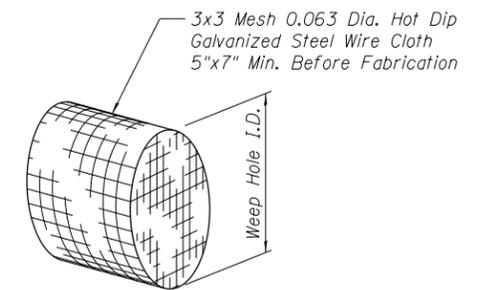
DETAIL AT THREE-SIDED PRECAST CONCRETE STRUCTURE
